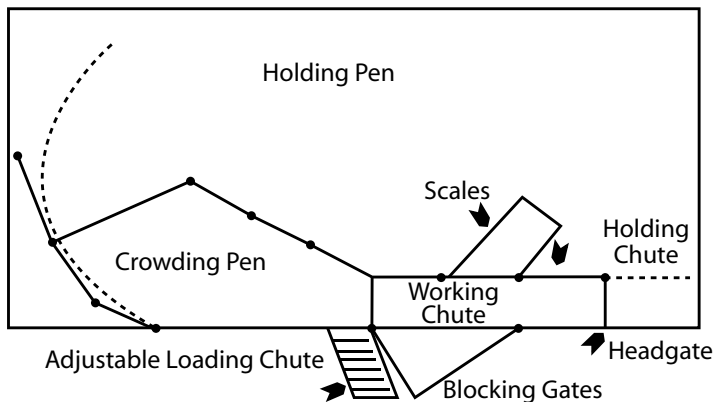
Sample Layout of Beef Cattle-Handling Facility.
